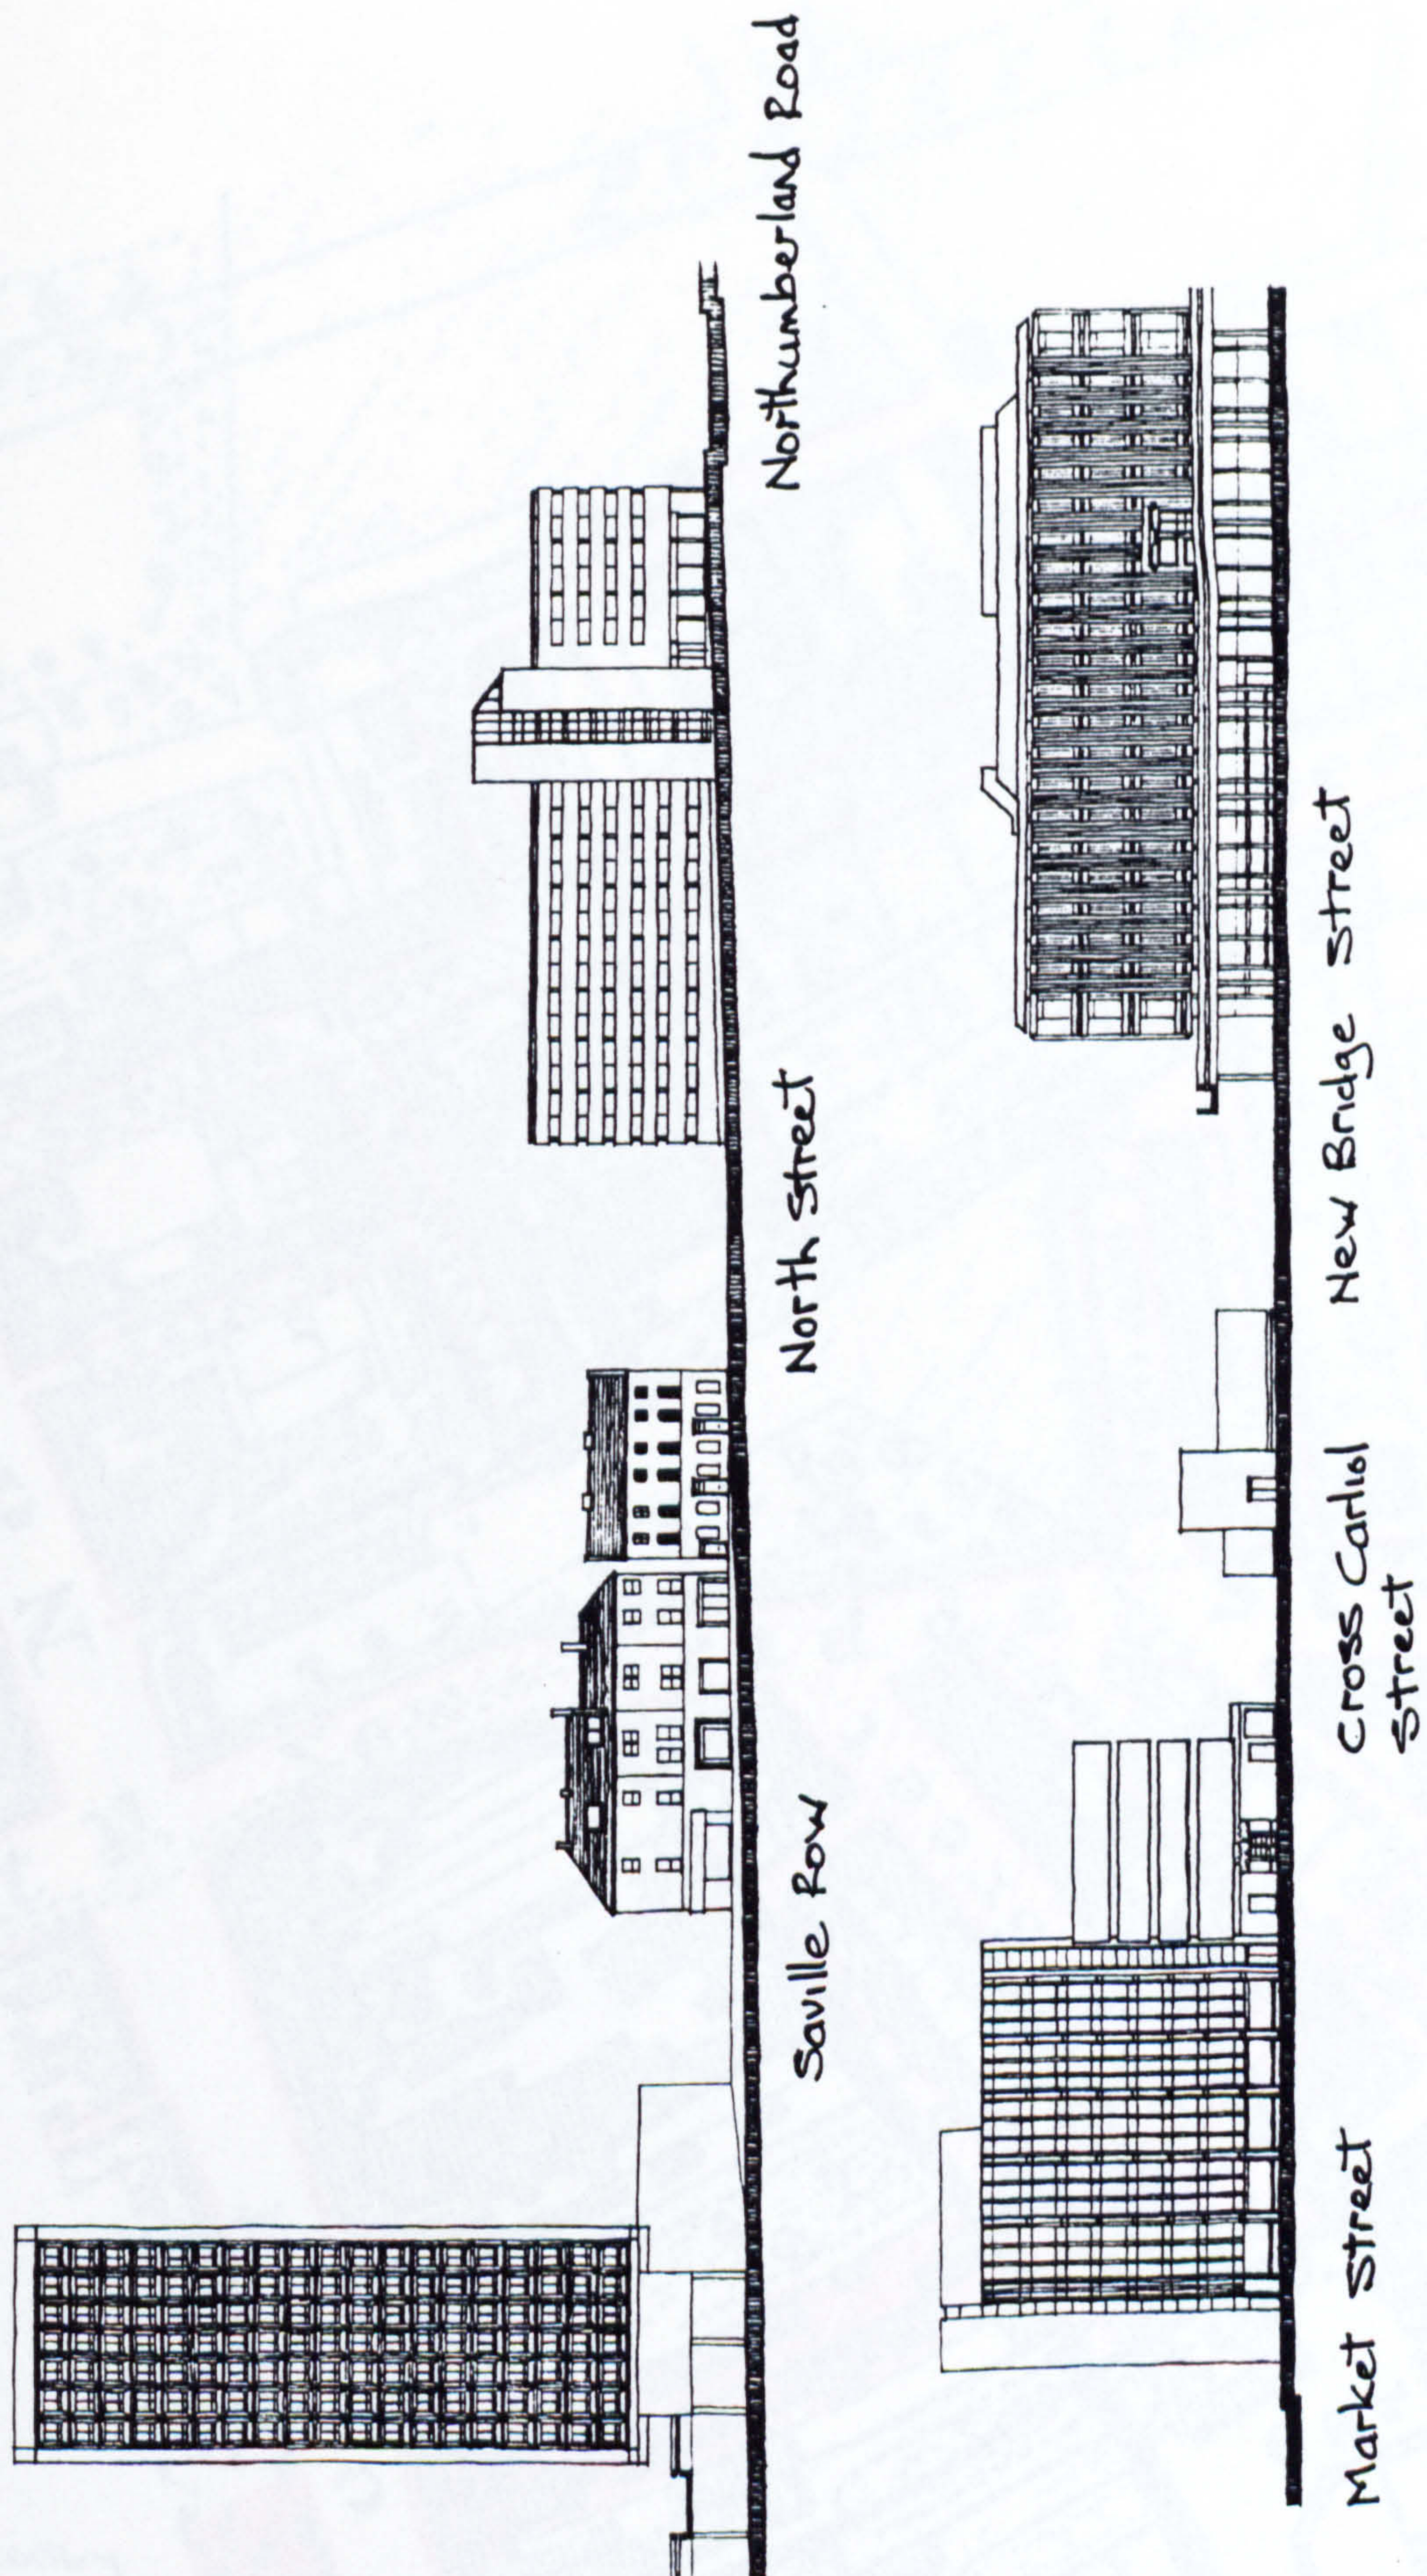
JOHN DOBSON STREET WEST SIDE ELEVATIONS 1991
